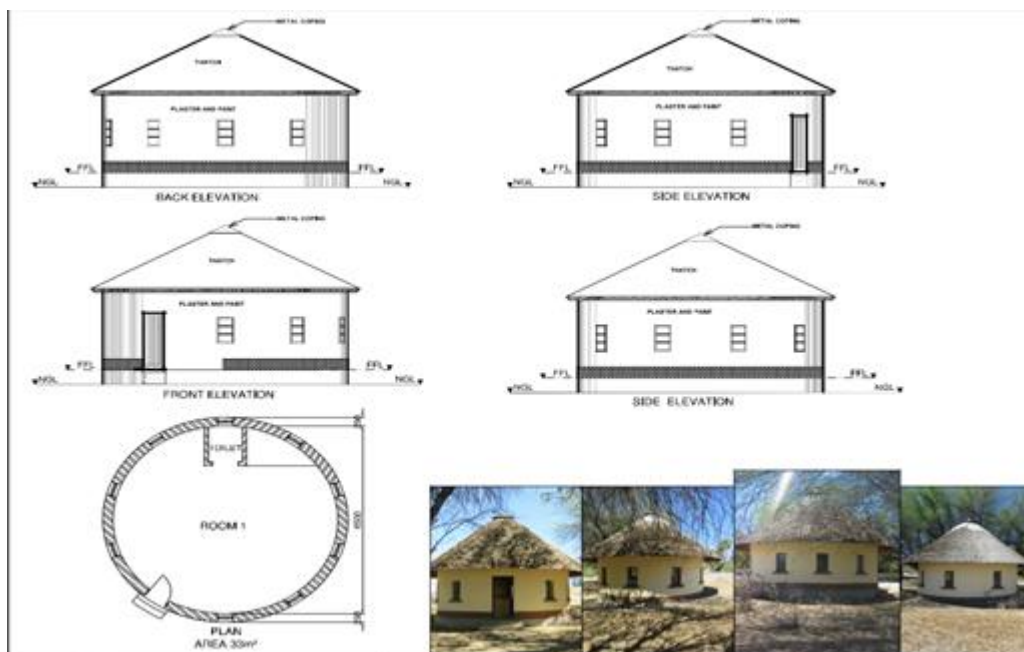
Swartfontein Rondavel – Existing Floor Plan and Elevations
